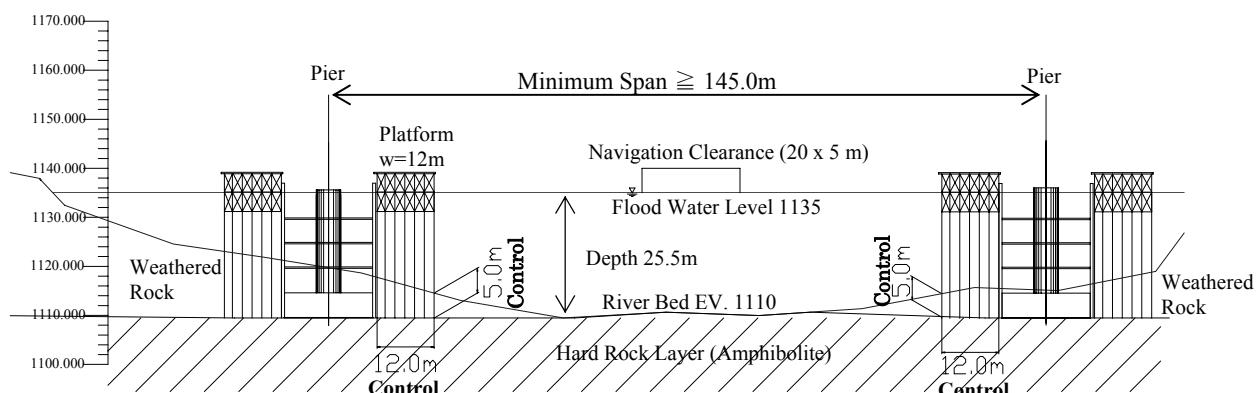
Method of Determining the Minimum Bridge Span (Ex. Bridge Location A)
